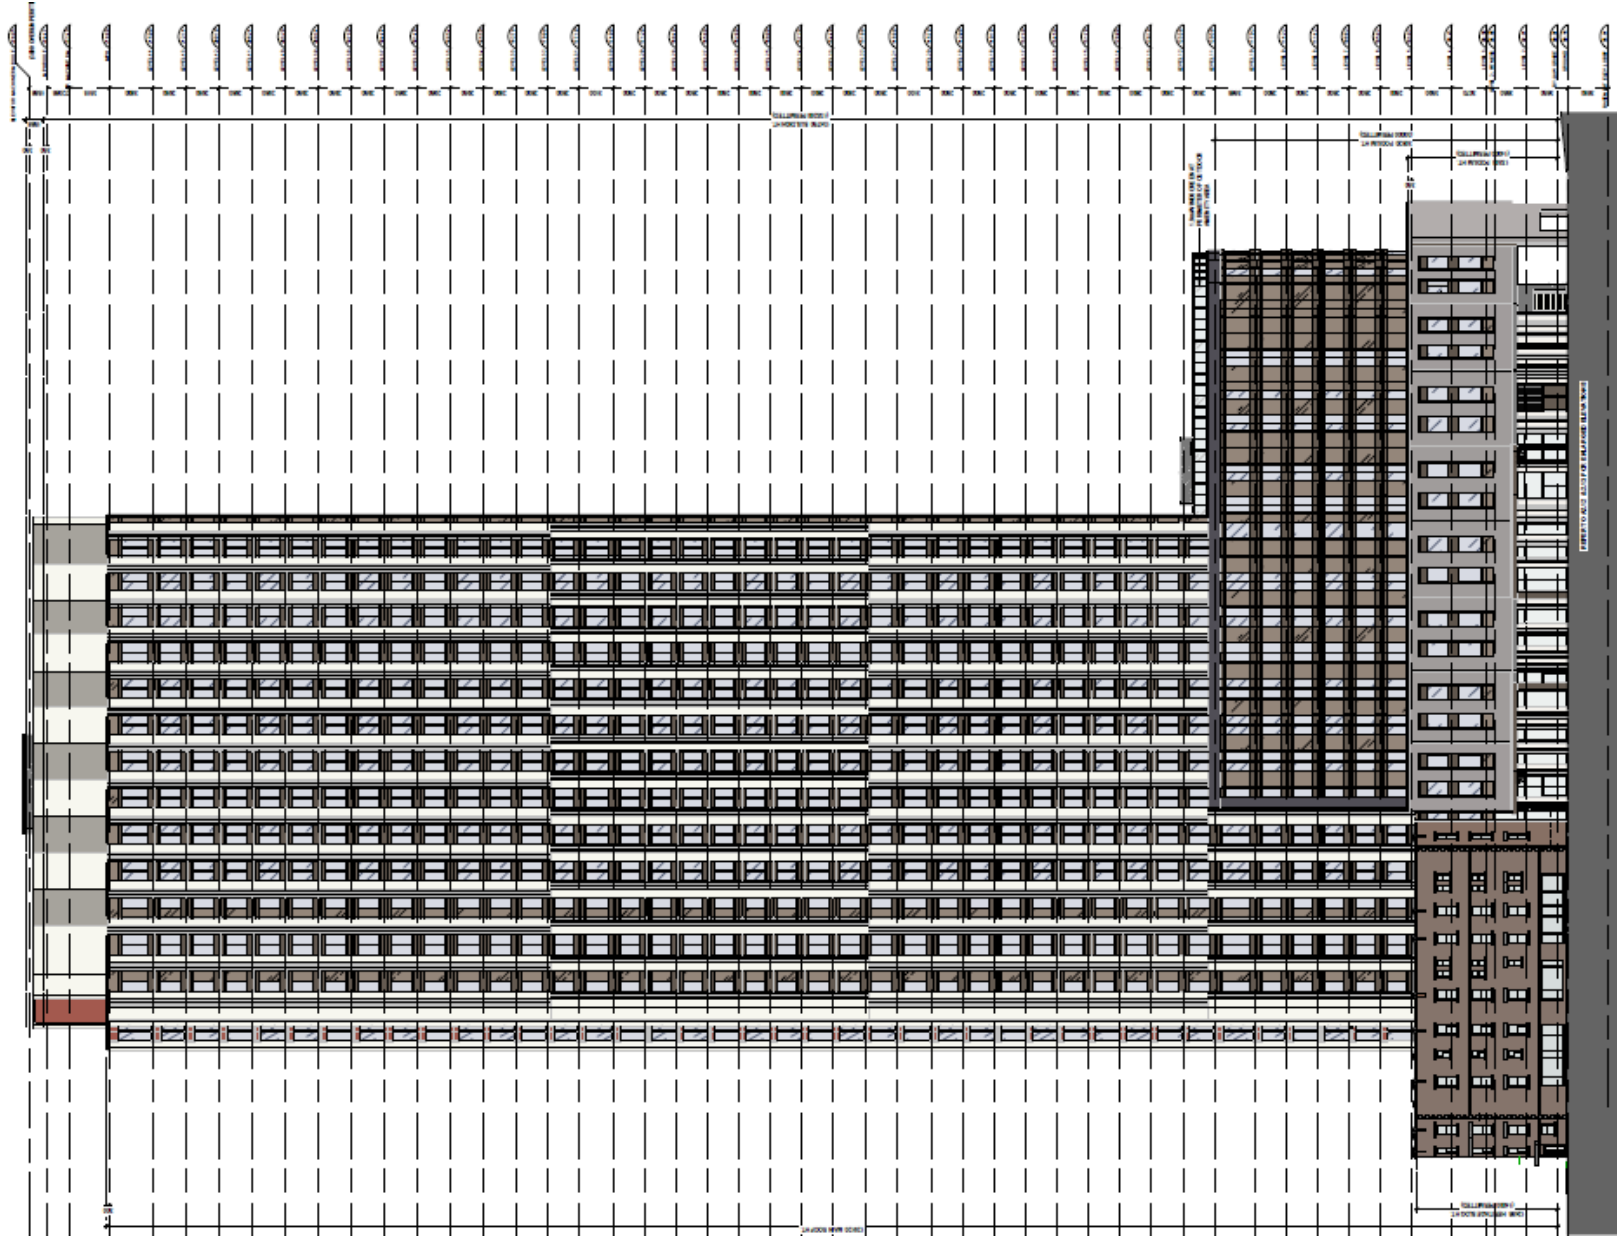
Proposed south elevation of 212 Dundas Street East included for illustration purposes (Rafael & Bigauskas Architects Inc., February 23, 2026).
